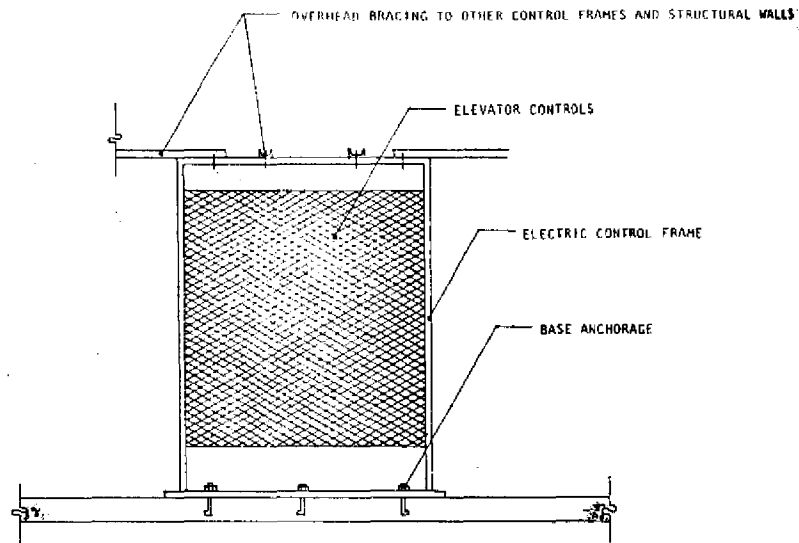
Elevator systems. Electric control panel showing base and top anchorage.
